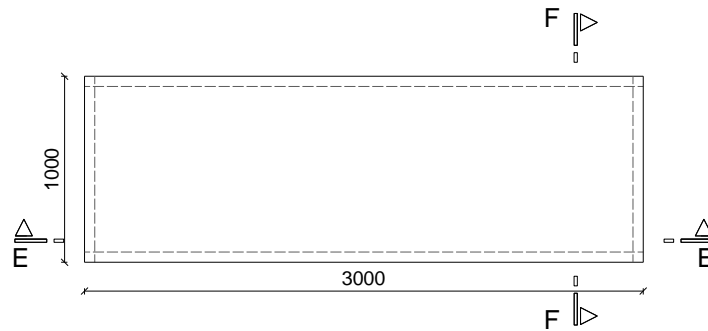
Geometry of proposed floor slab sandwich panels (all units in millimeters).
